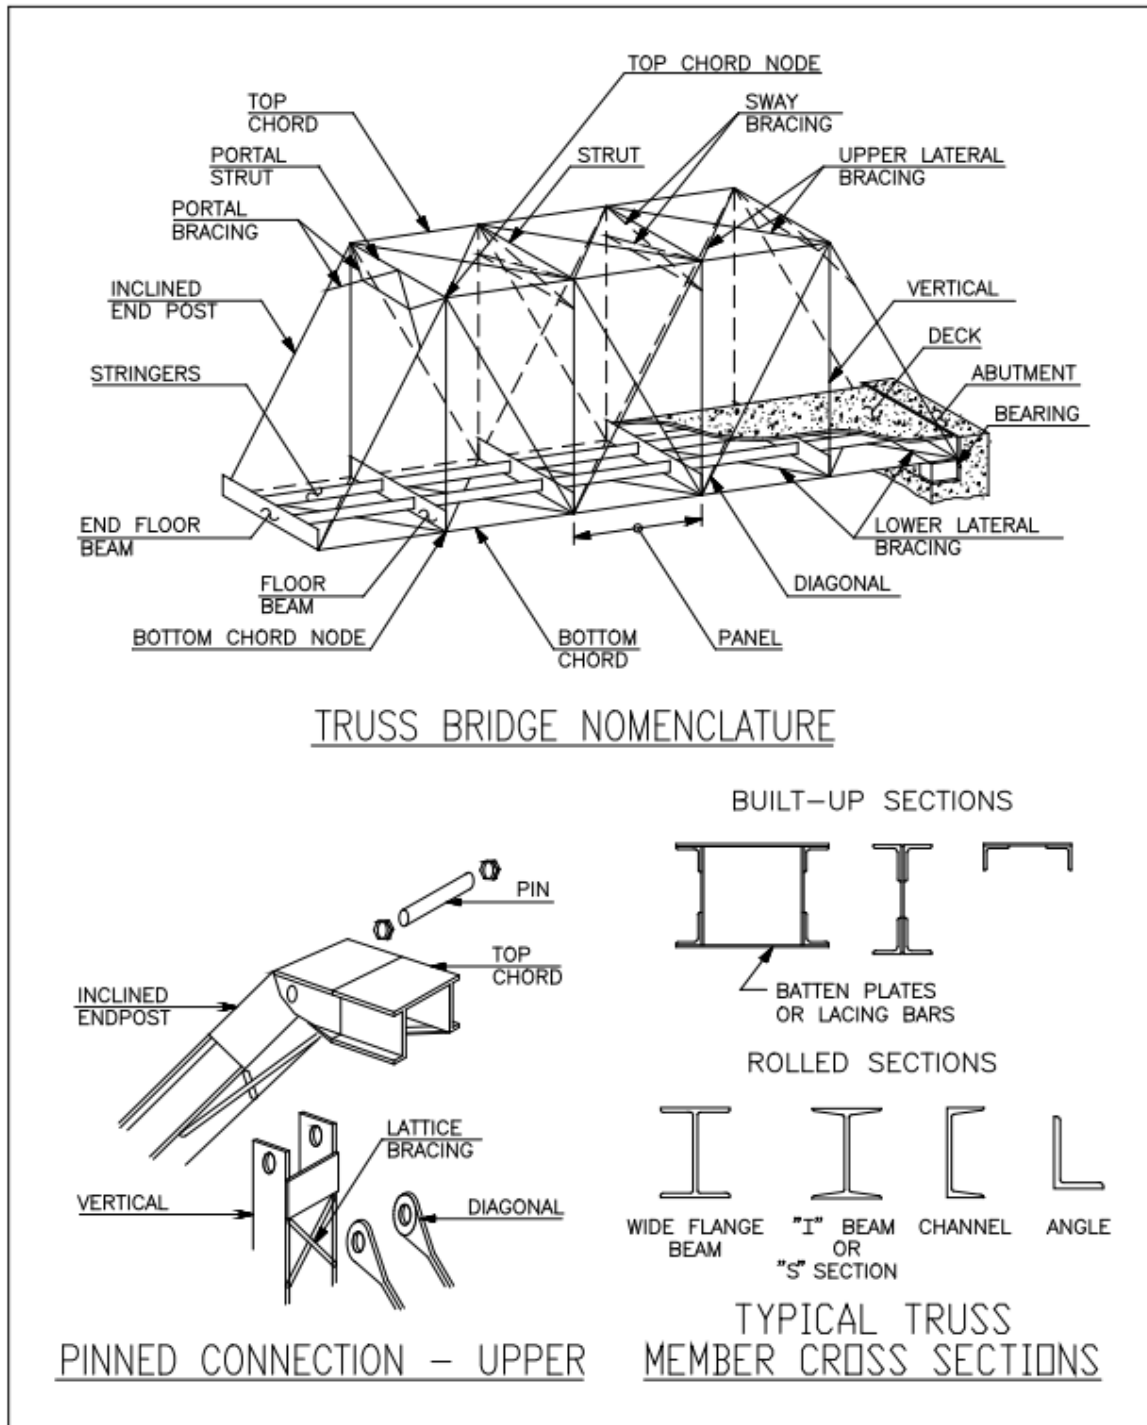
Truss Bridge Nomenclature and Details.
